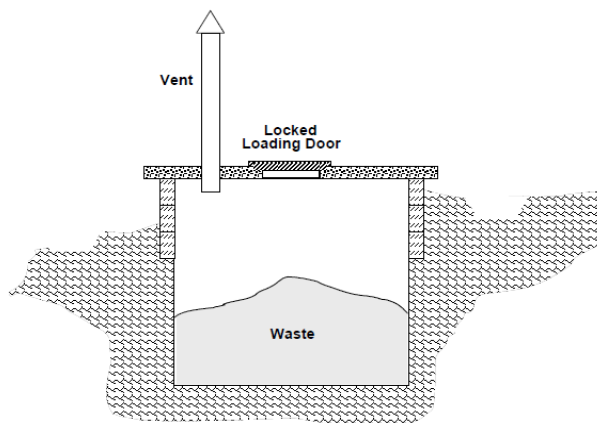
Cross - Sectional view of secured disposal pit for PHC organic waste
